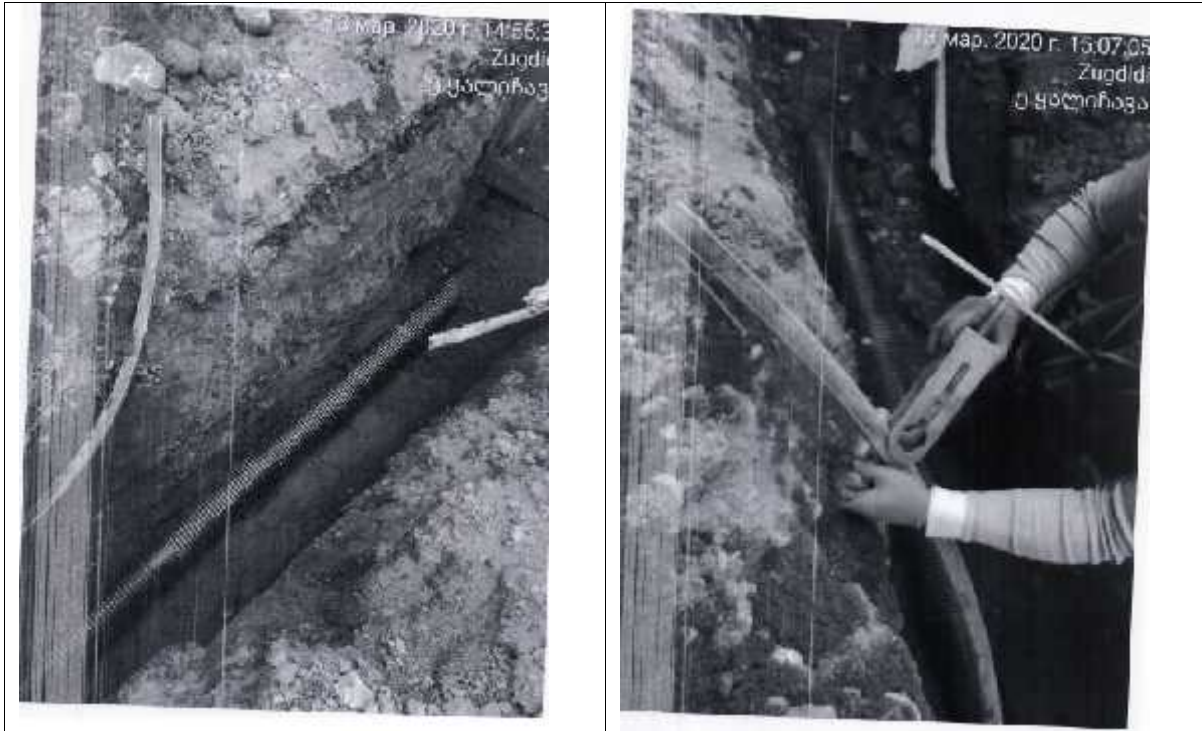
Damaged underground infrastructure and the same section after rehabilitation – Rustaveli Str.
